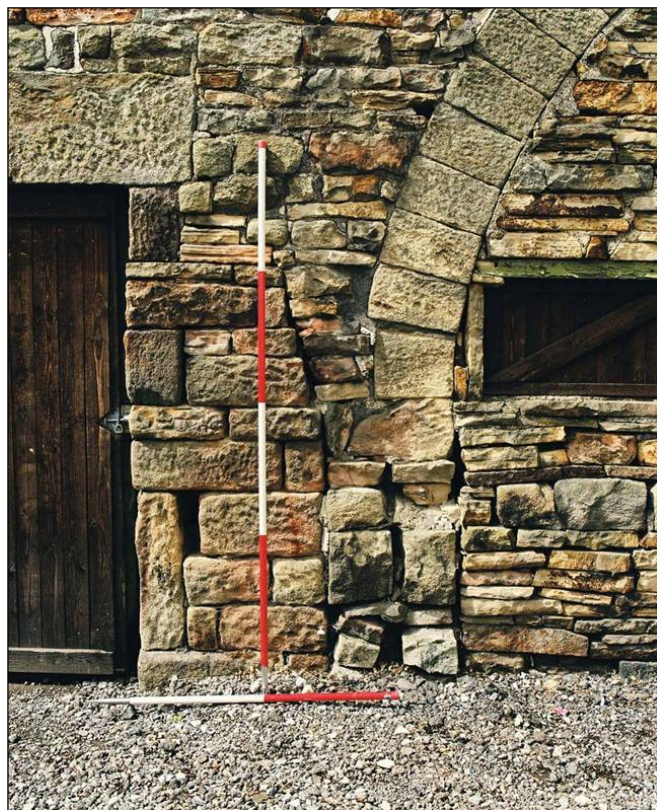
Detail of scar from removed lehr in east elevation (film 1.10)
